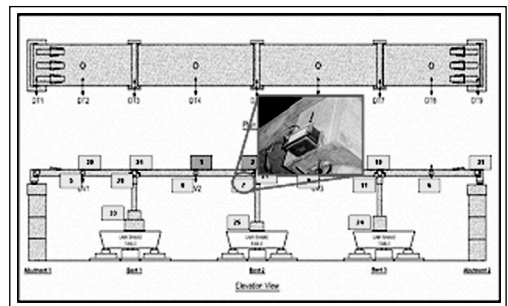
Test set-up of four-span three pier bridge with wireless sensor installation.
